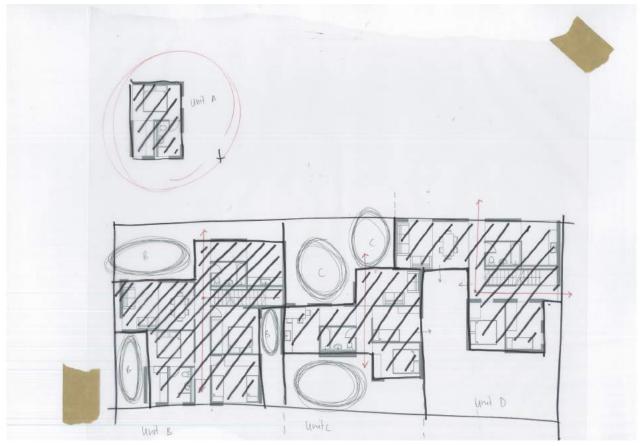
Oversketch of designed floor plan extracting common volumes, disregarding programme
